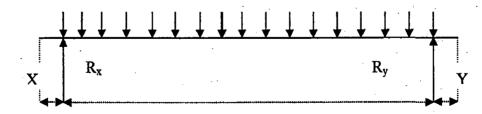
Case – I : Assuming horizontal girder as a minged one at support poin 0.25 (1) Maximum load at bottom horizontal girder
